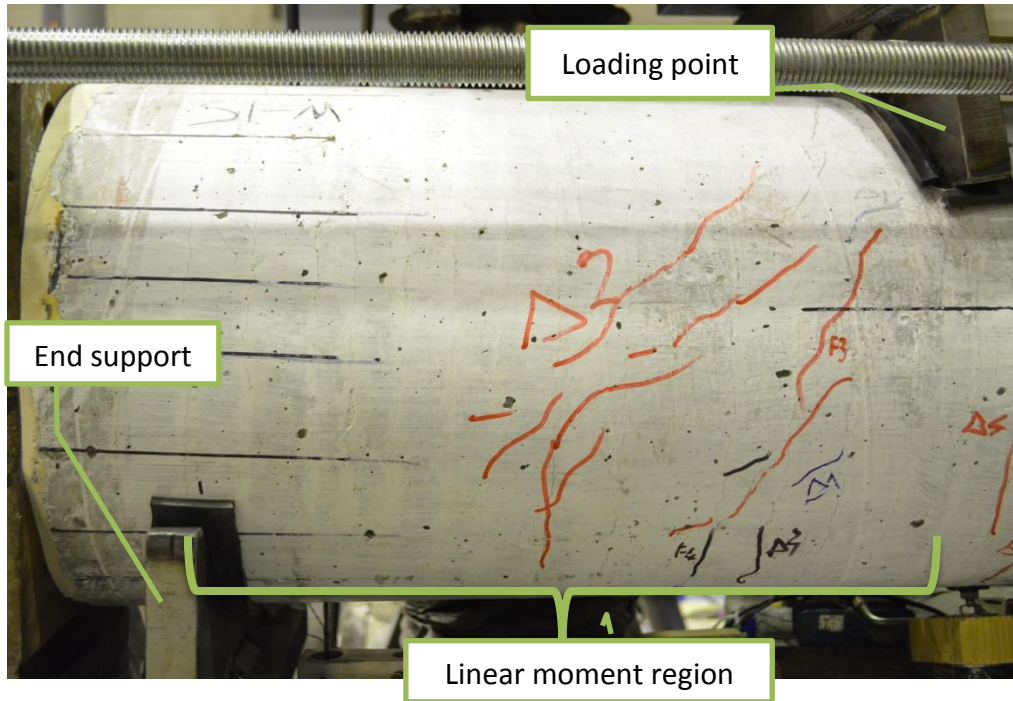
Specimen SC1-M Shear Cracking at Peak Displacement
